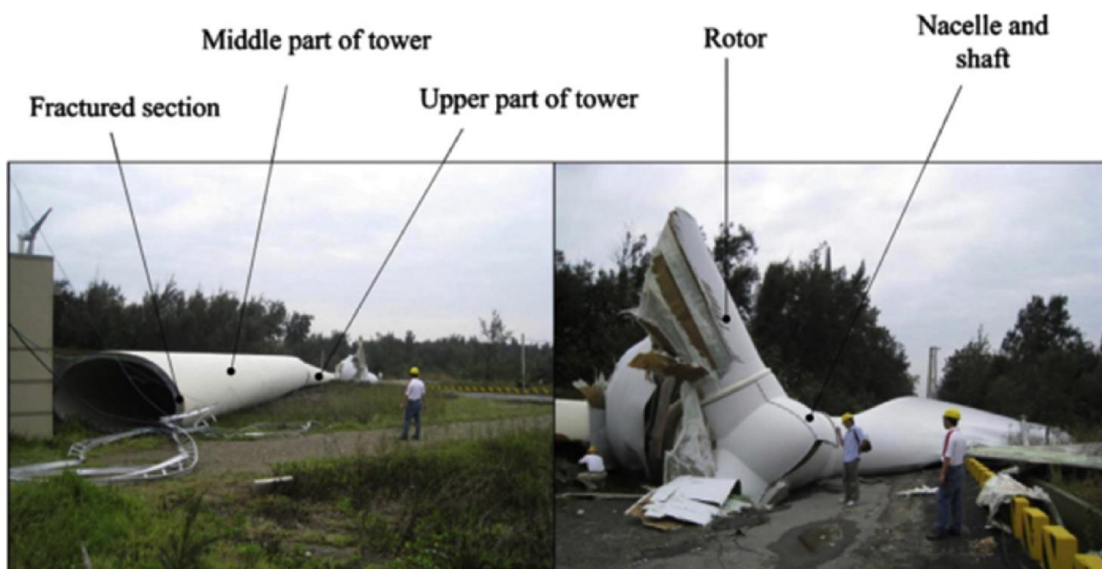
On-site photo of a collapsed wind turbine [3].
